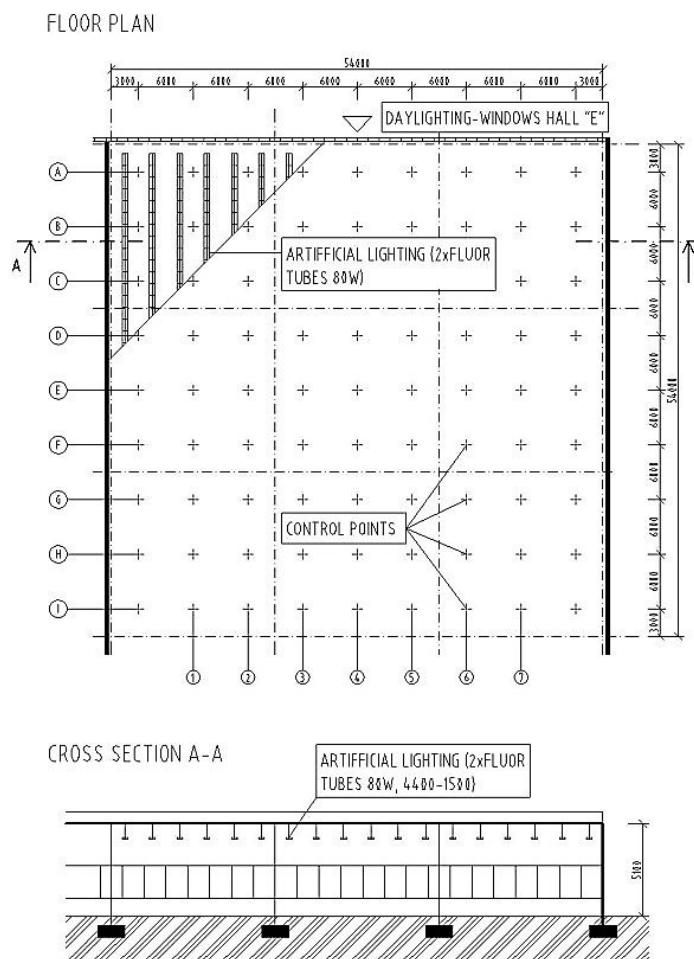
Floor plan and distribution of integral lighting system in Hall E (dimensions in millimeter).
